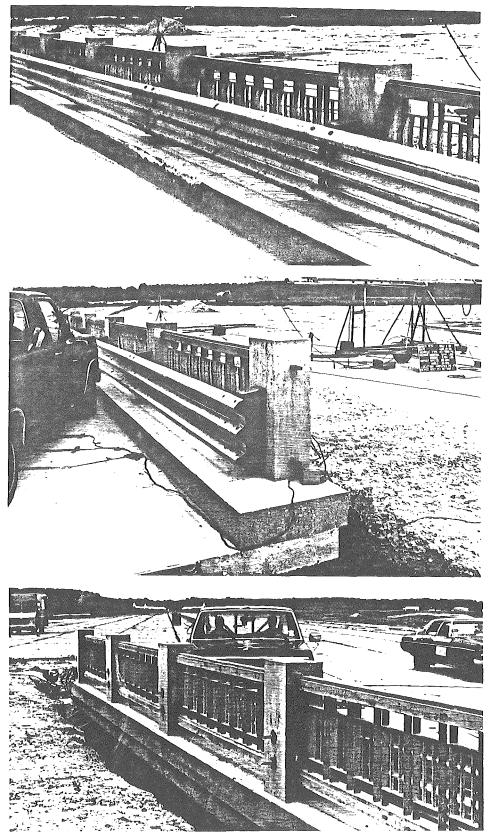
Pretest photographs of bridge rail system, test 1952-2-89.
